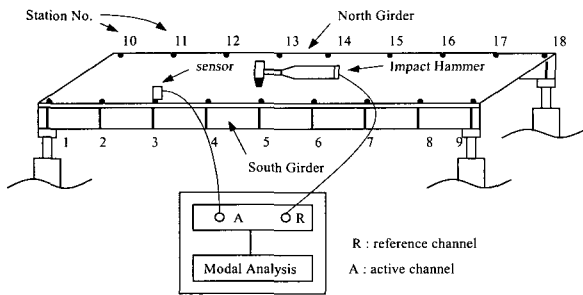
Hammer Test Set-up on Model Plate-Girder
